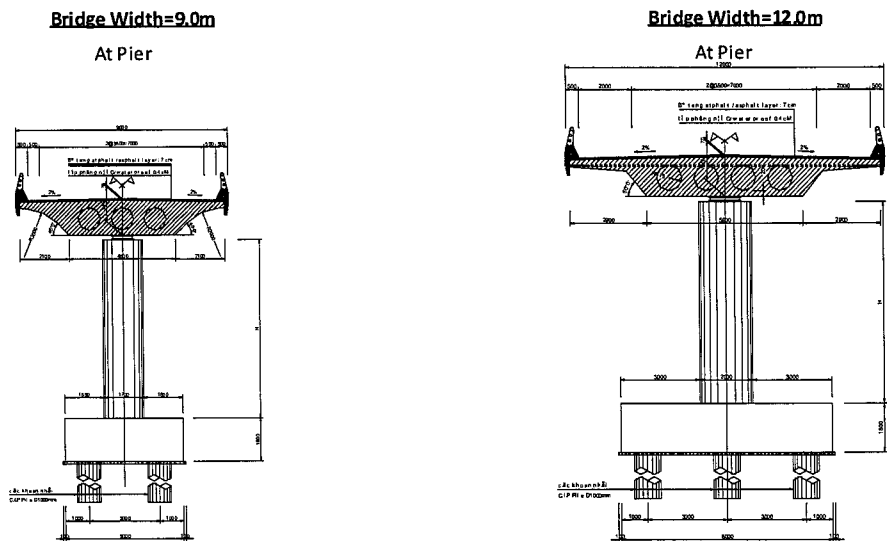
Typical Cross Sections of Flyovers in F/S Plan
